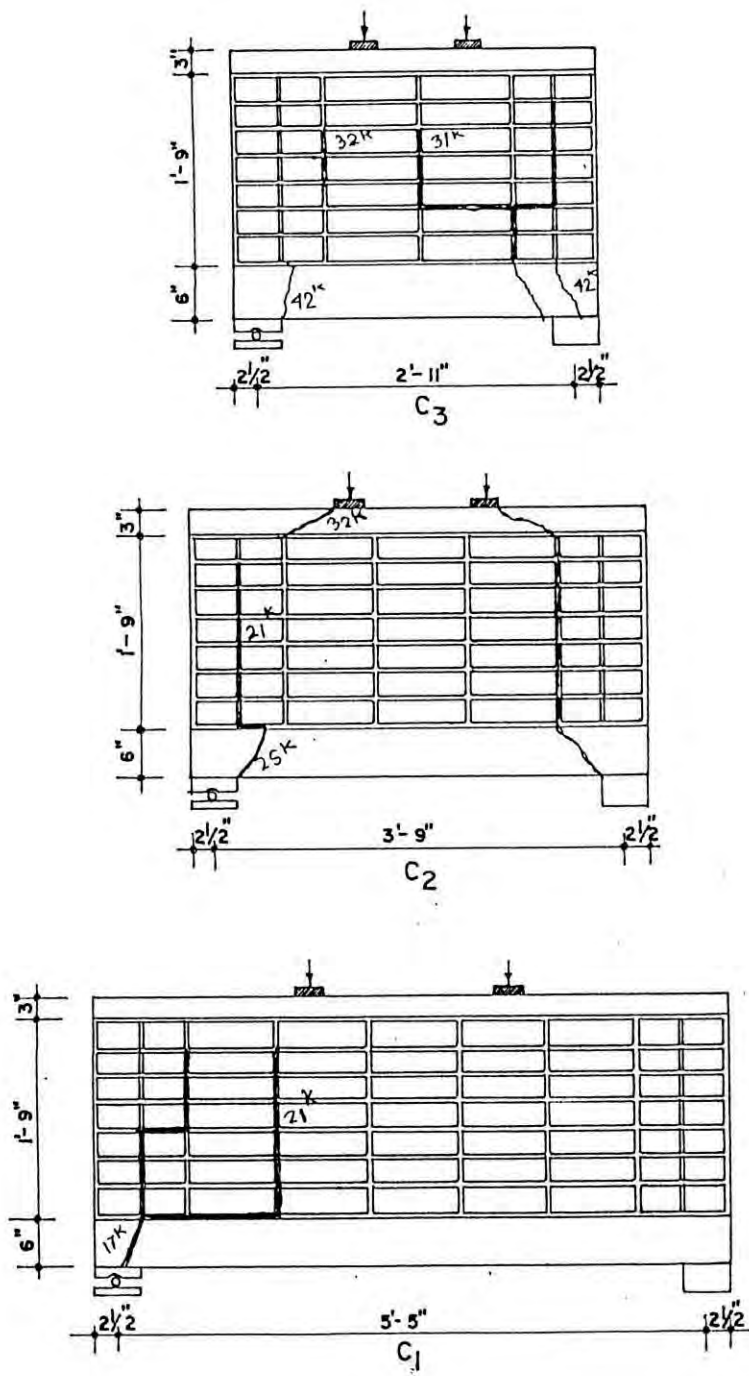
Crack Pattern of Stack Bonded Composite Wall-Beam with Vertical Reinforcement in Wall Group C
